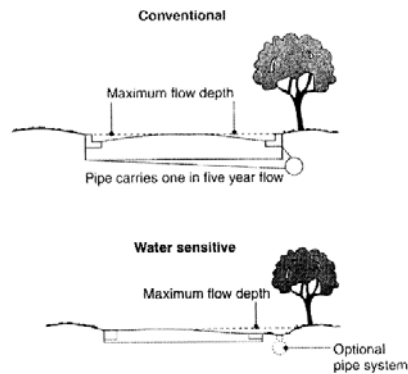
Conventional and WSUD road cross section (Source: Engineers Australia 2006)
